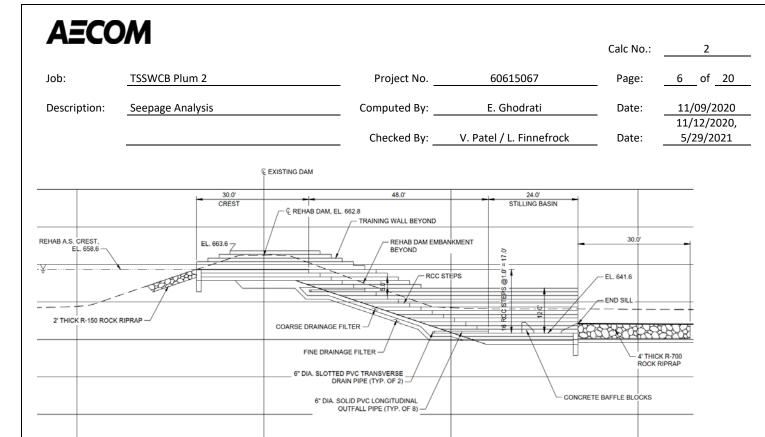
Proposed Internal Drainage System for proposed Overtopping Spillway Section
